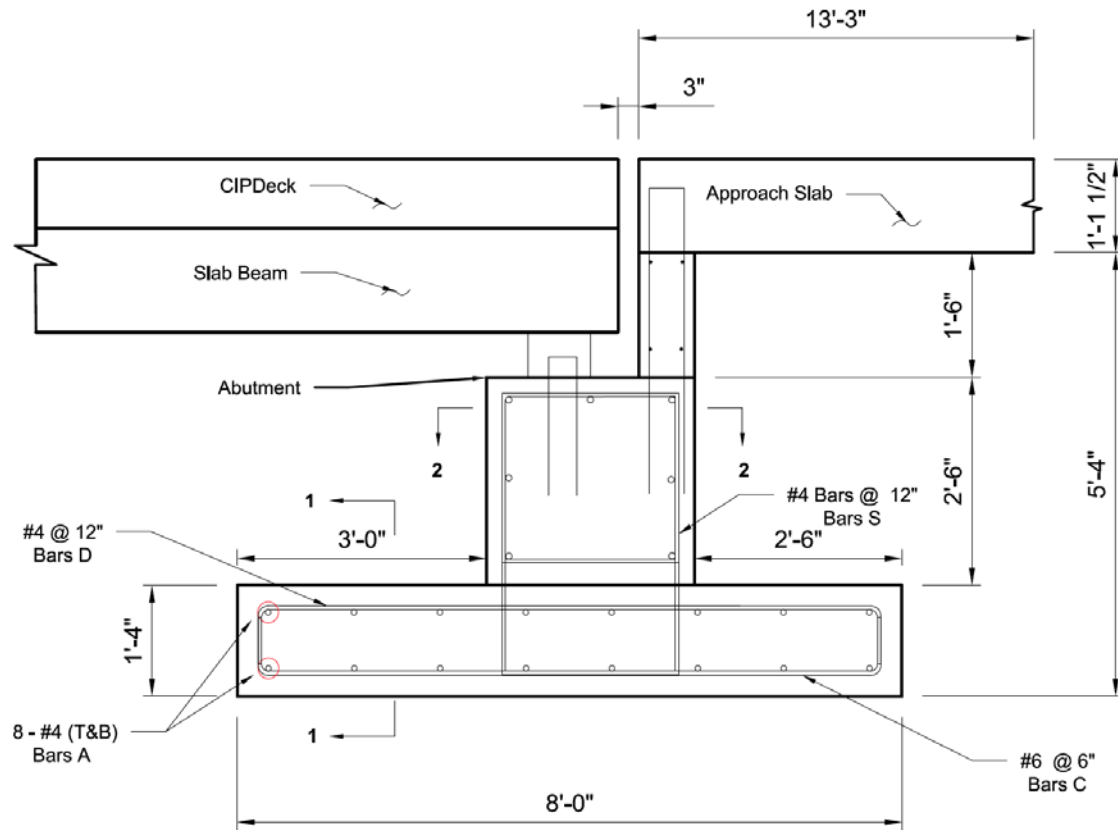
Dimensions and Reinforcement of Footing and Abutment.
